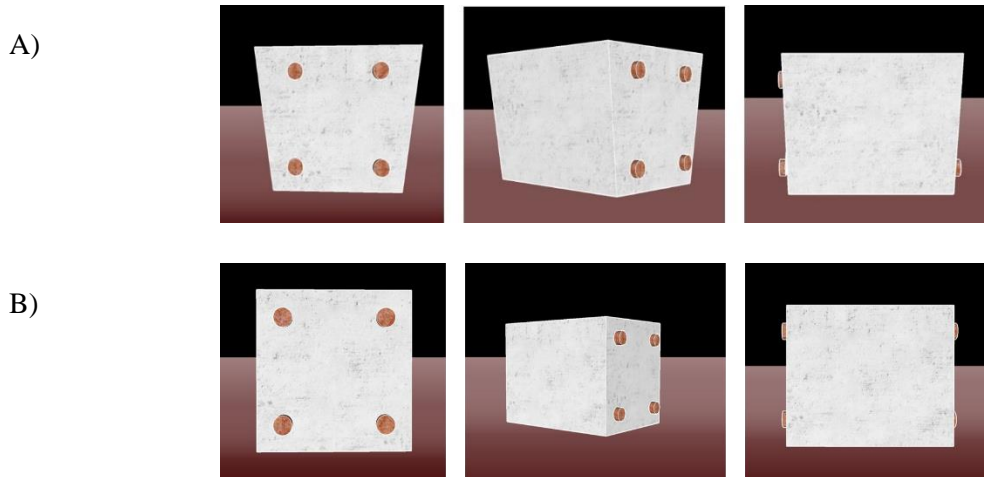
A) Damaged ASR affected concrete block B) Undamaged concrete block.
